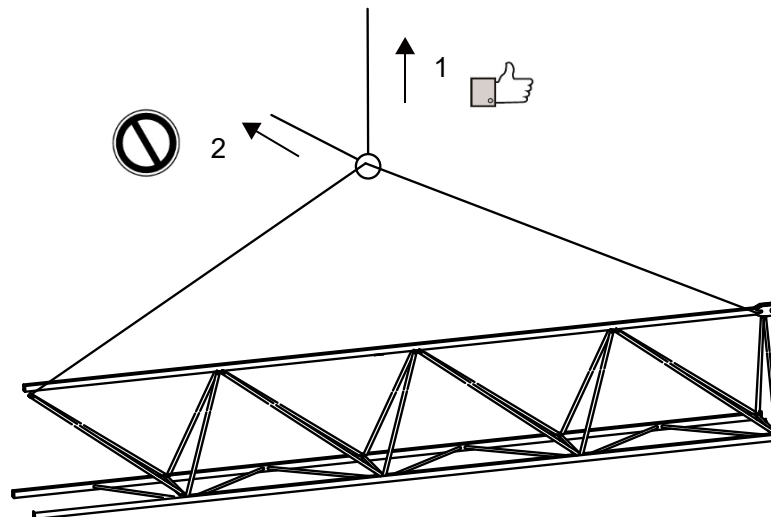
Lifting rope winding way of the rest jib assembly
